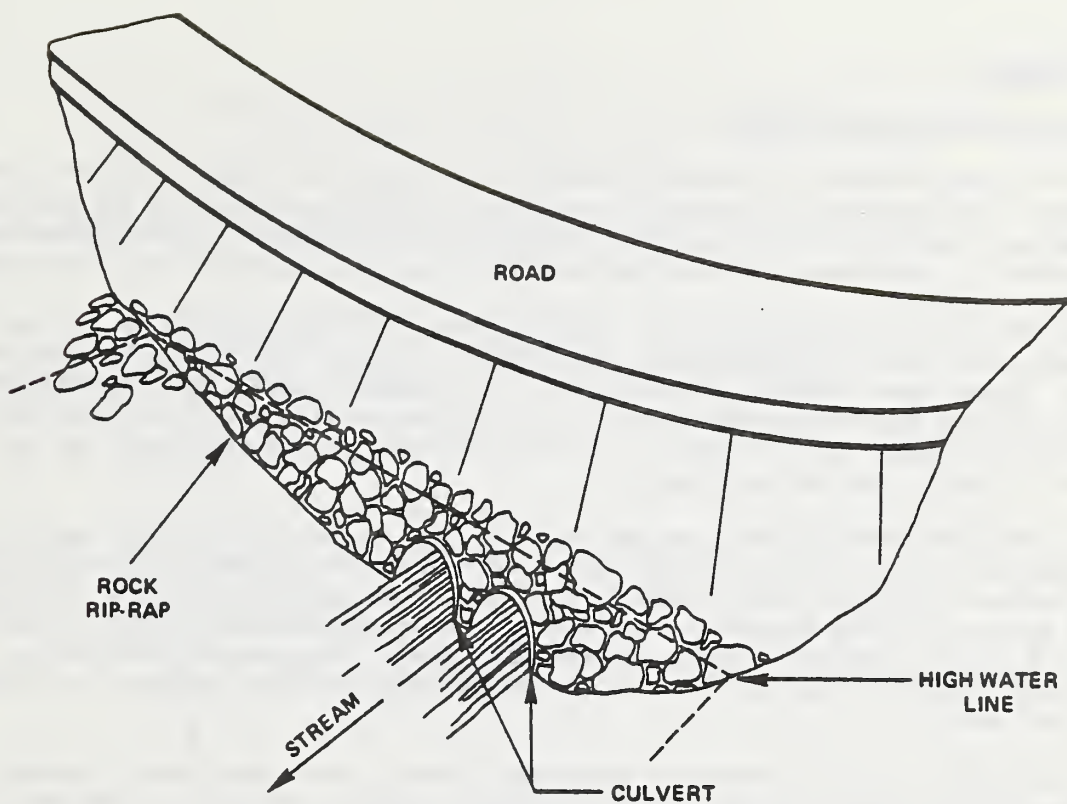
Rock rip-rap protection for embankment at a culvert installation.
